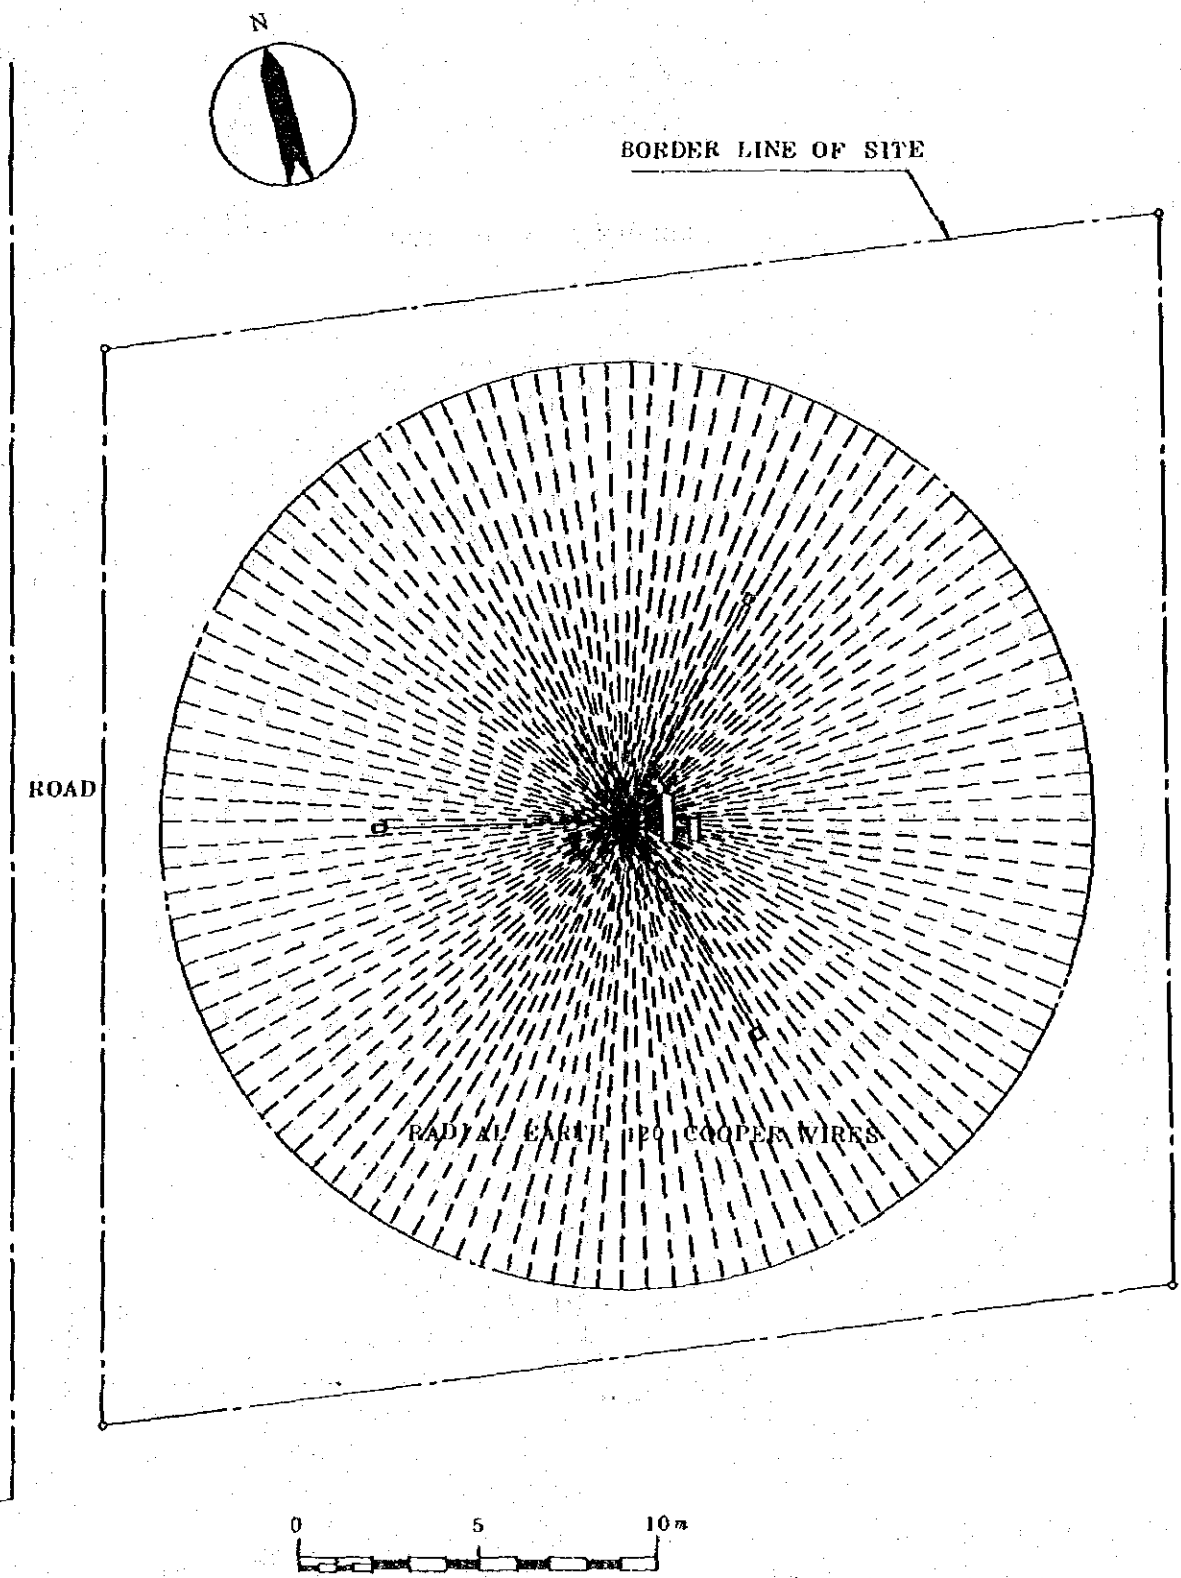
Layout of Tower and Earth of Atbara
